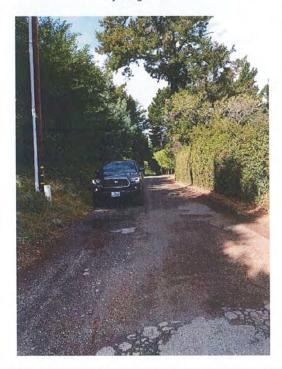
RP 6. Typical section of Chambers Rd (County maintained. State Road No.: 2D020). Vehicle traveling east, photo taken facing east.
